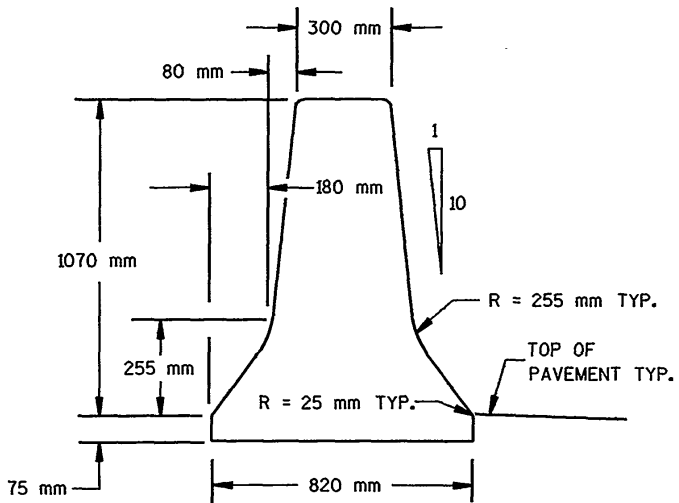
Tall Wall Concrete Safety Shape (Non-Reinforced)
